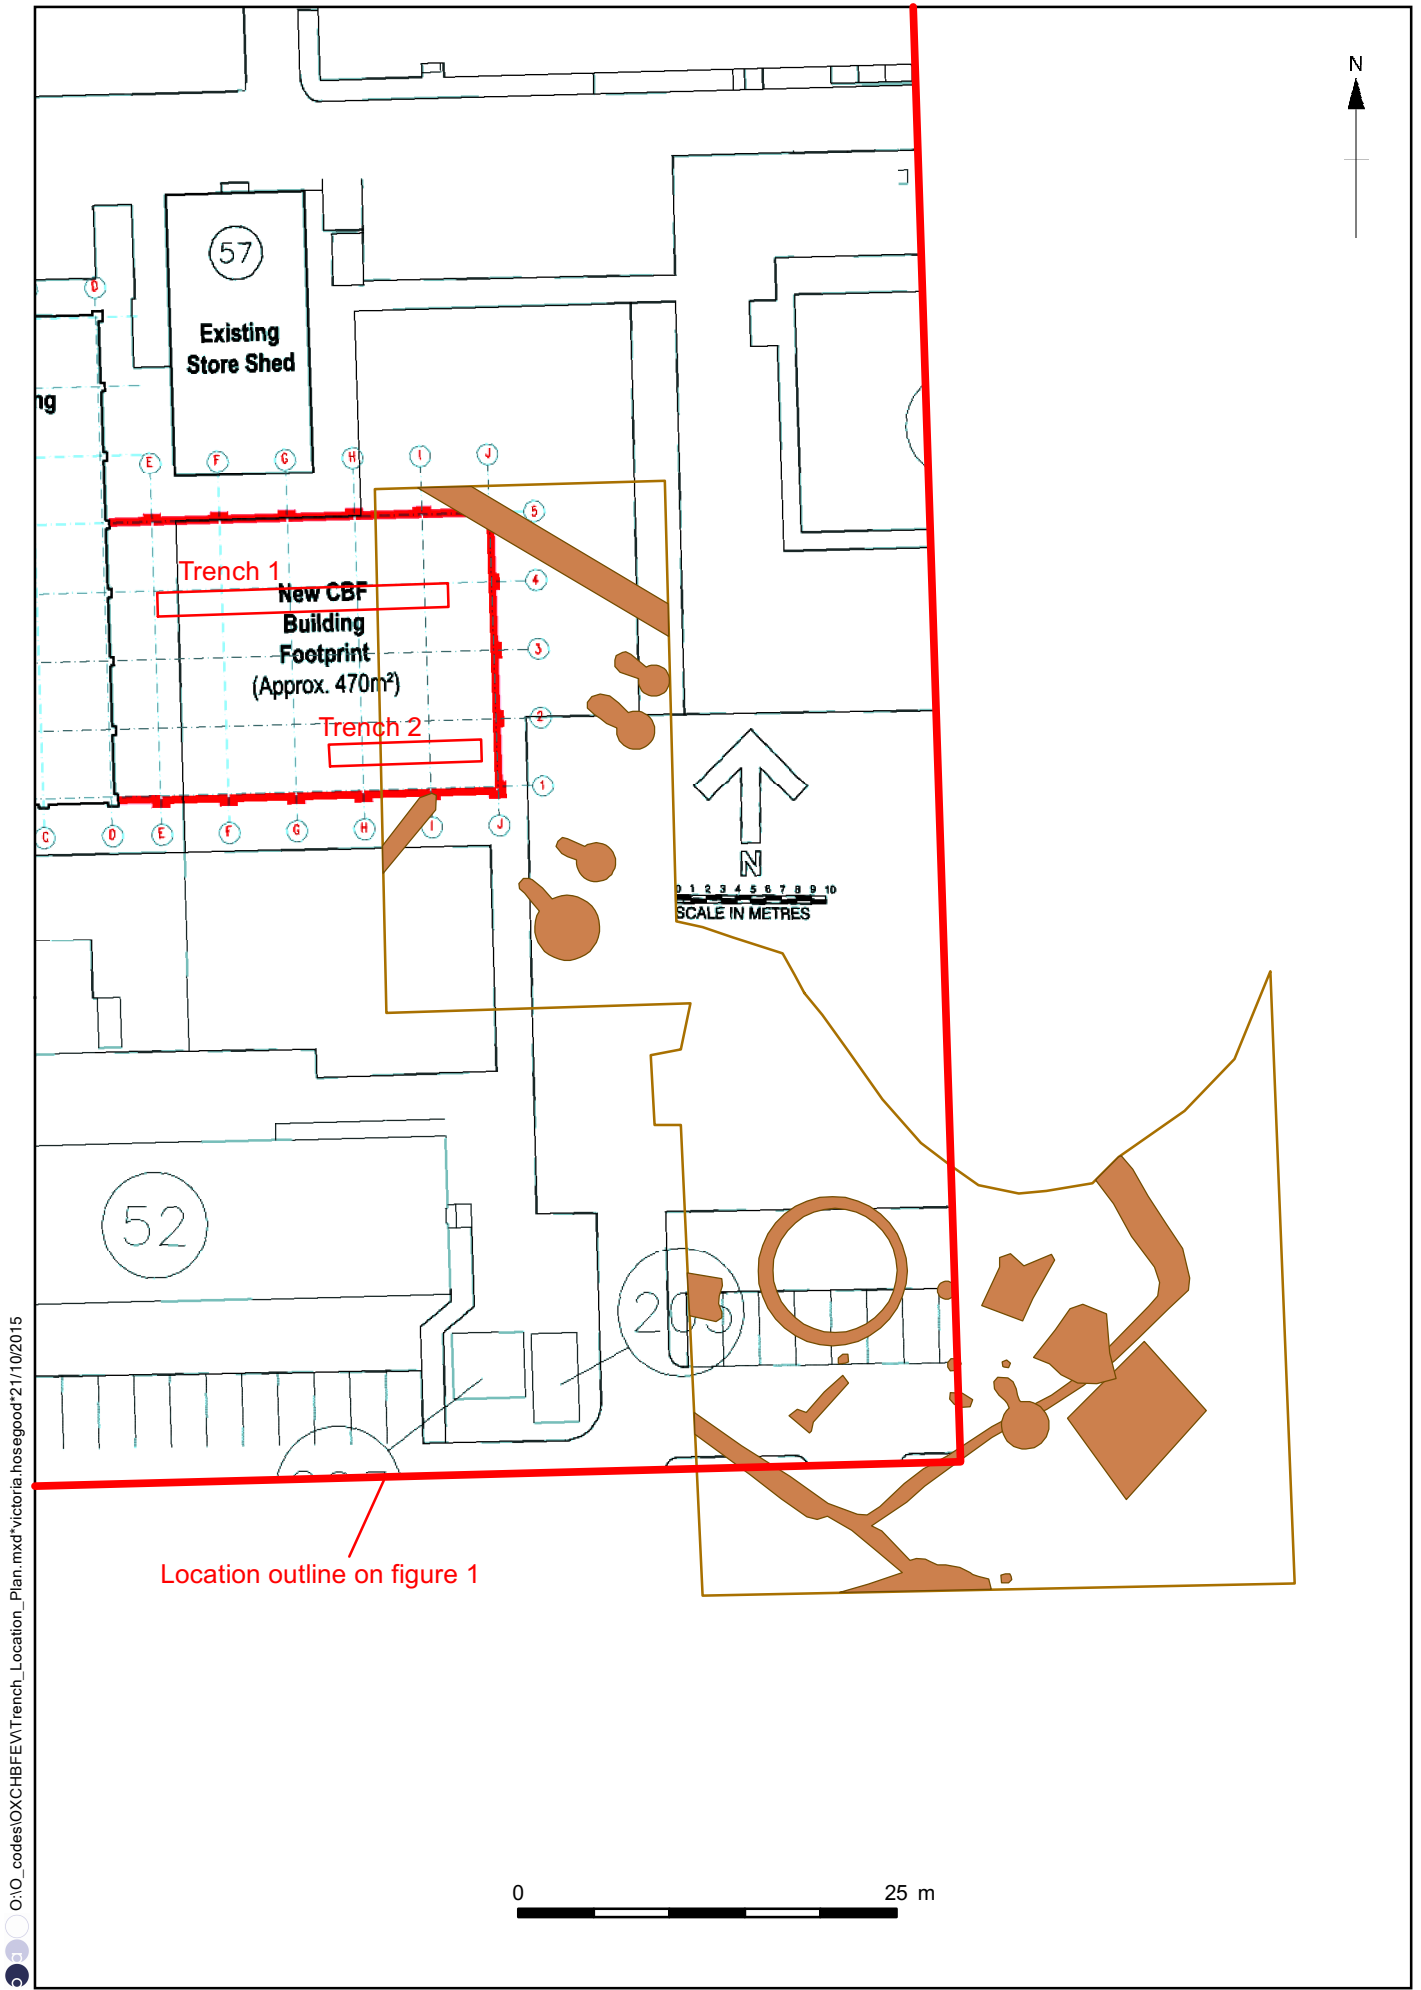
Trench locations and outline of proposed building location with overlay of 1970s excavation features
